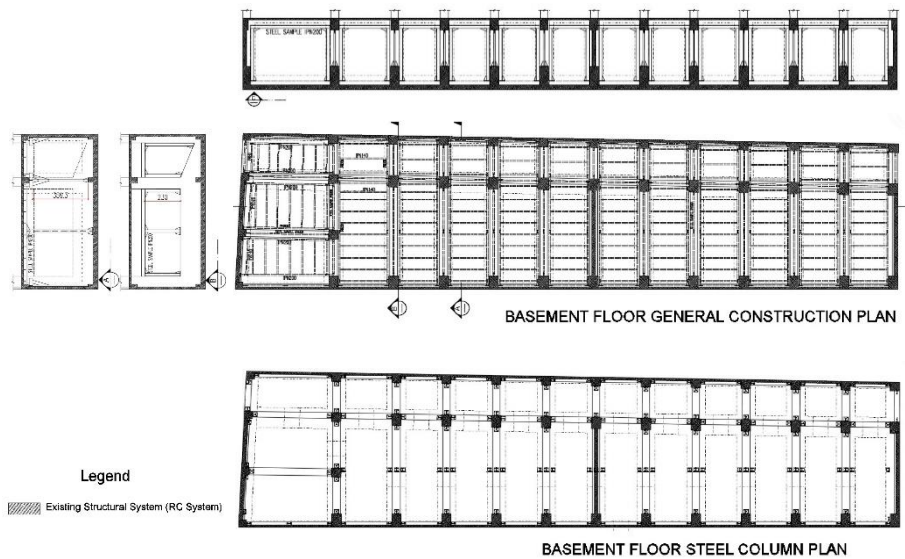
The design project regarding the steel constructions made in the strengthening of the basement floor
